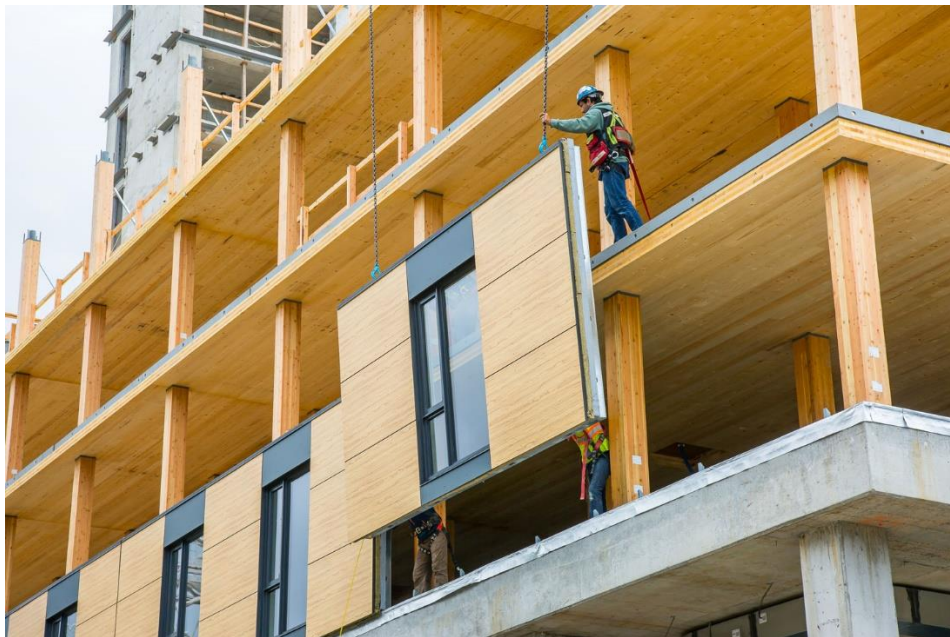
Brock Commons Tallwood house during construction, showing glulam columns [18]
